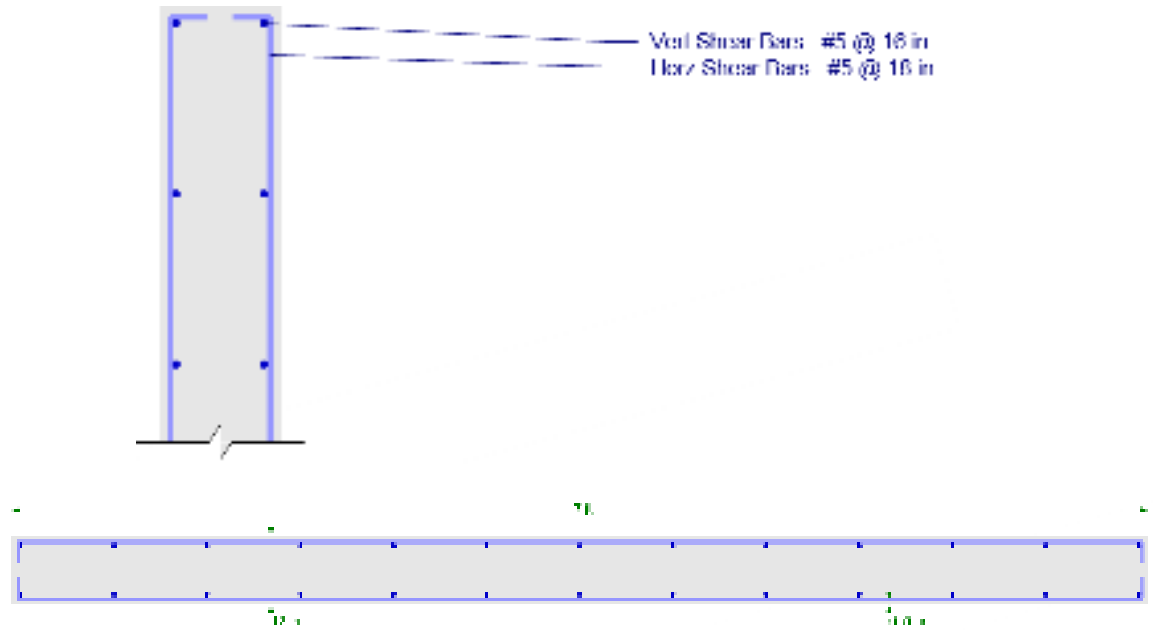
Building (B10-12S-M-S) Special RC Shear Reinforcement Details; Wall Section for Floors 10-12
